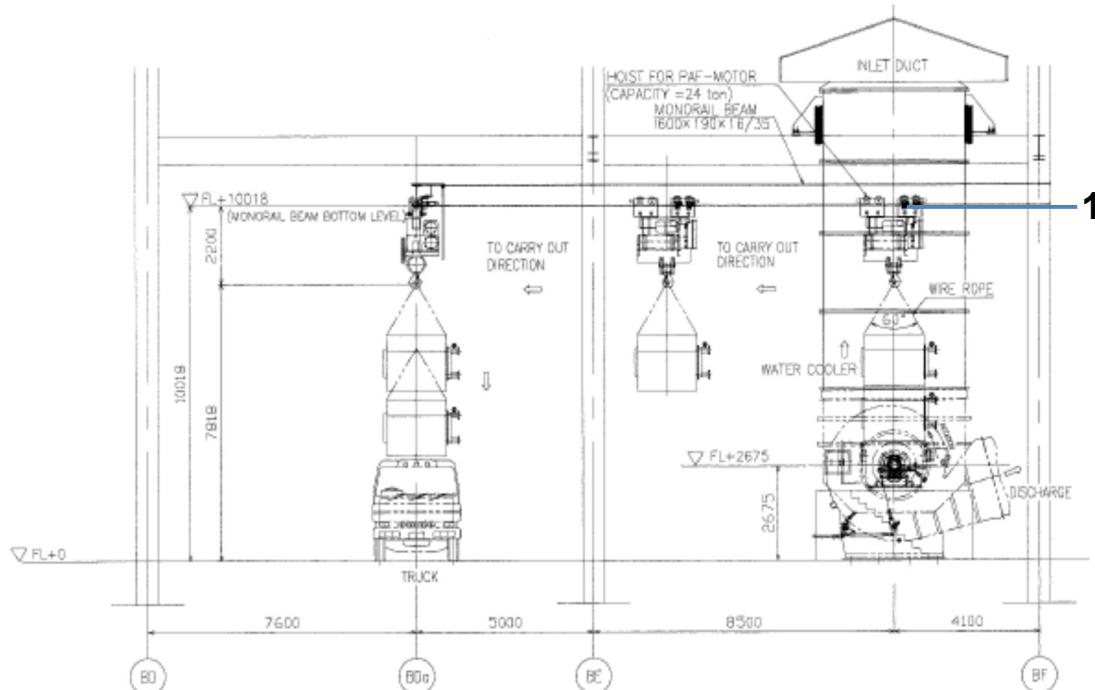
Hoist Arrangement (Typical arrangement example)
